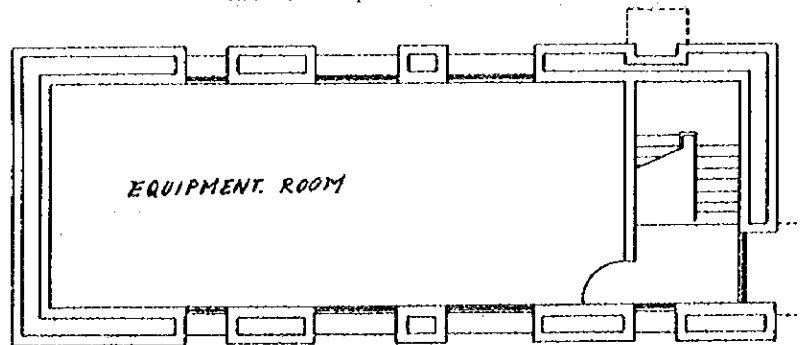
Plan (2nd Story) of Type D Radio Repeater Station
